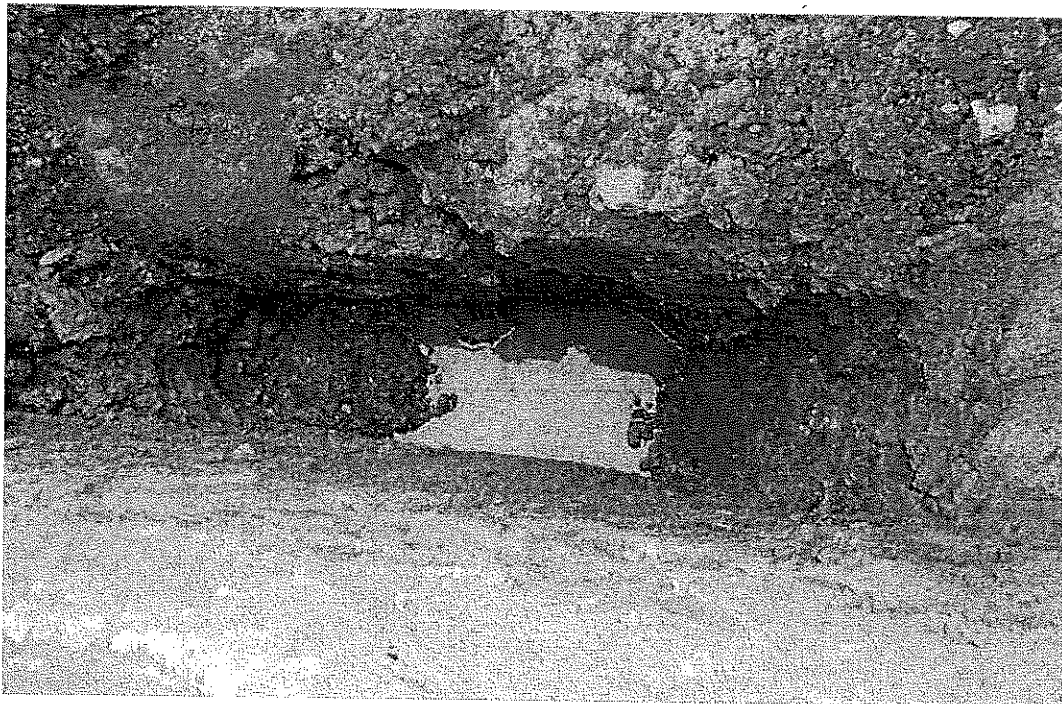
Groundwater collecting in soil sampling location at a depth of about 8 feet below the ground surface.
